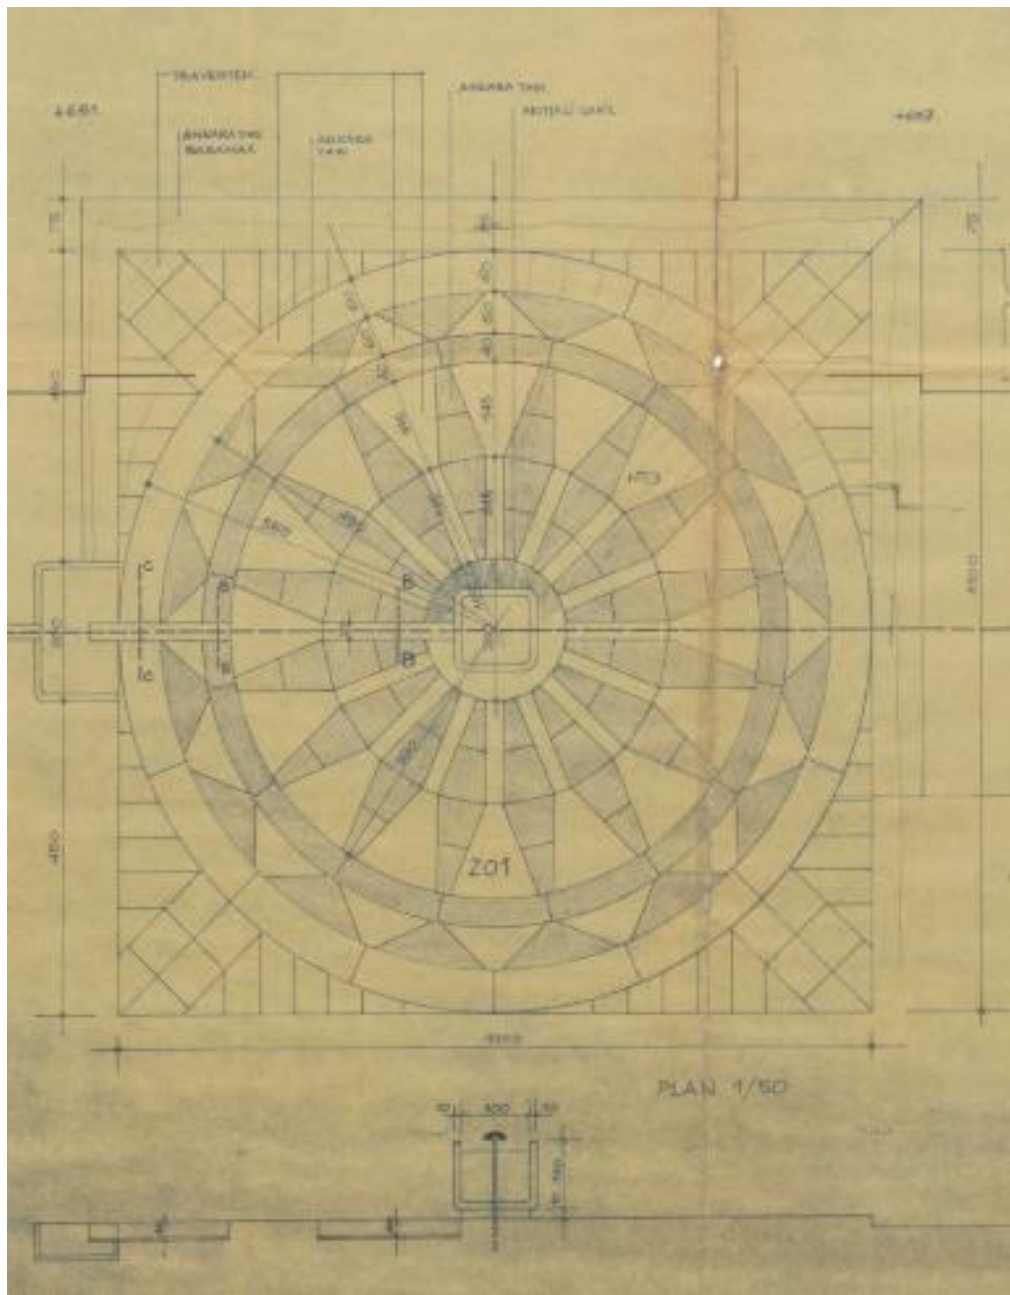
Entrance floor of the Library building centered with Fountain. (Salt Archives)
